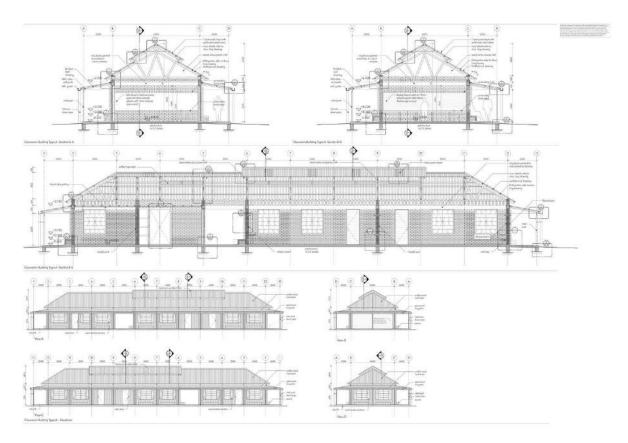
Cross sections and elevations of COF classrooms (Localworks, 2015)
